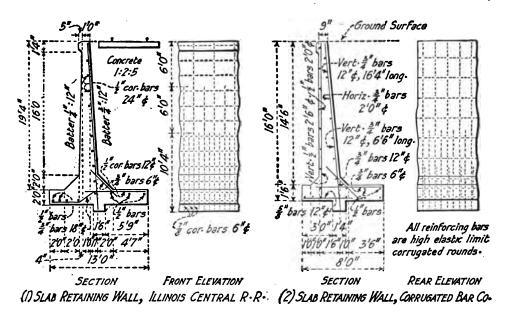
EXAMPLES OF MASONRY RETAINING WALLS.
